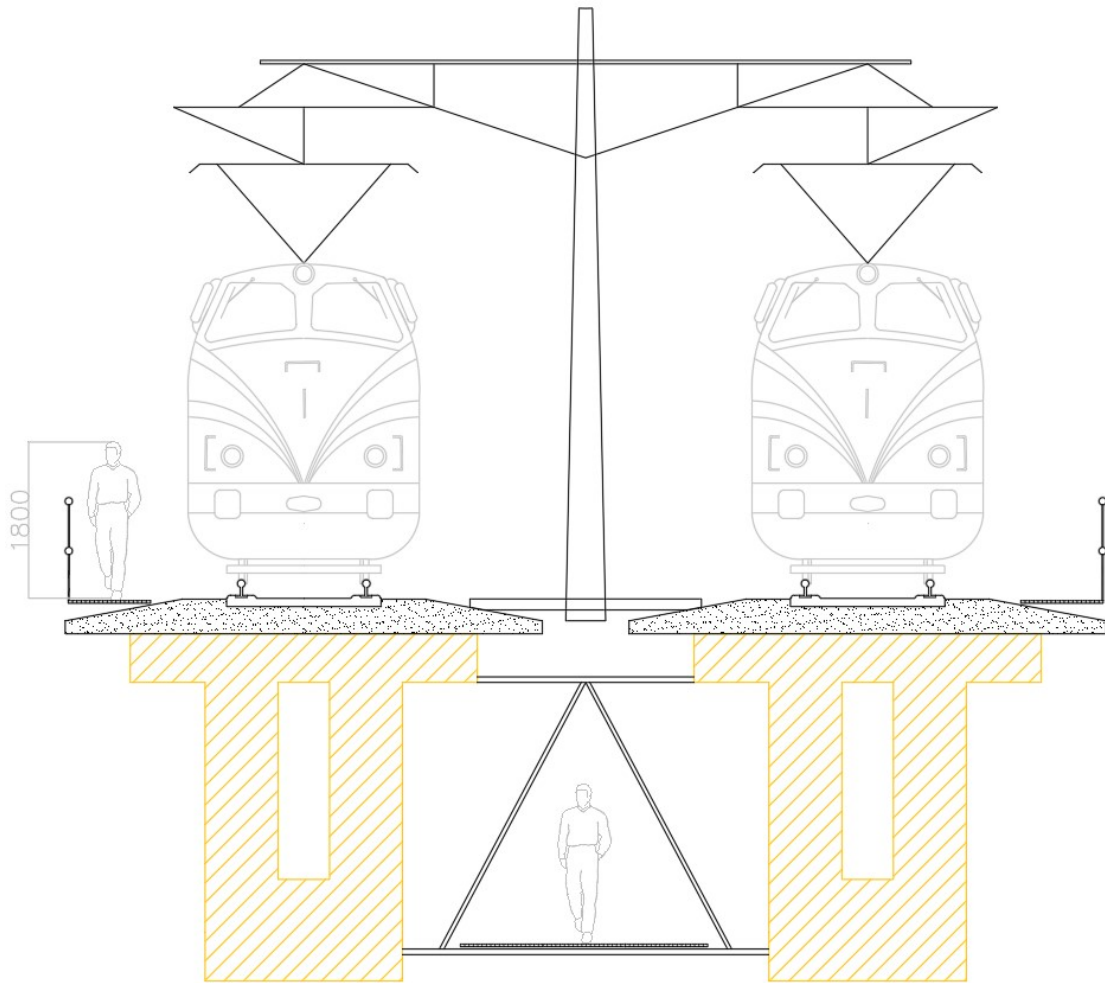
Cross-section drawing of improved box girder including additional components.
